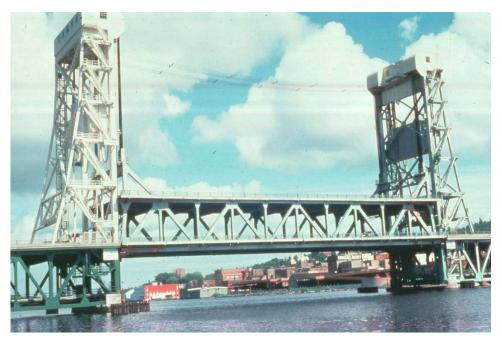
Concrete Counterweight on a Vertical Lift Bridge
